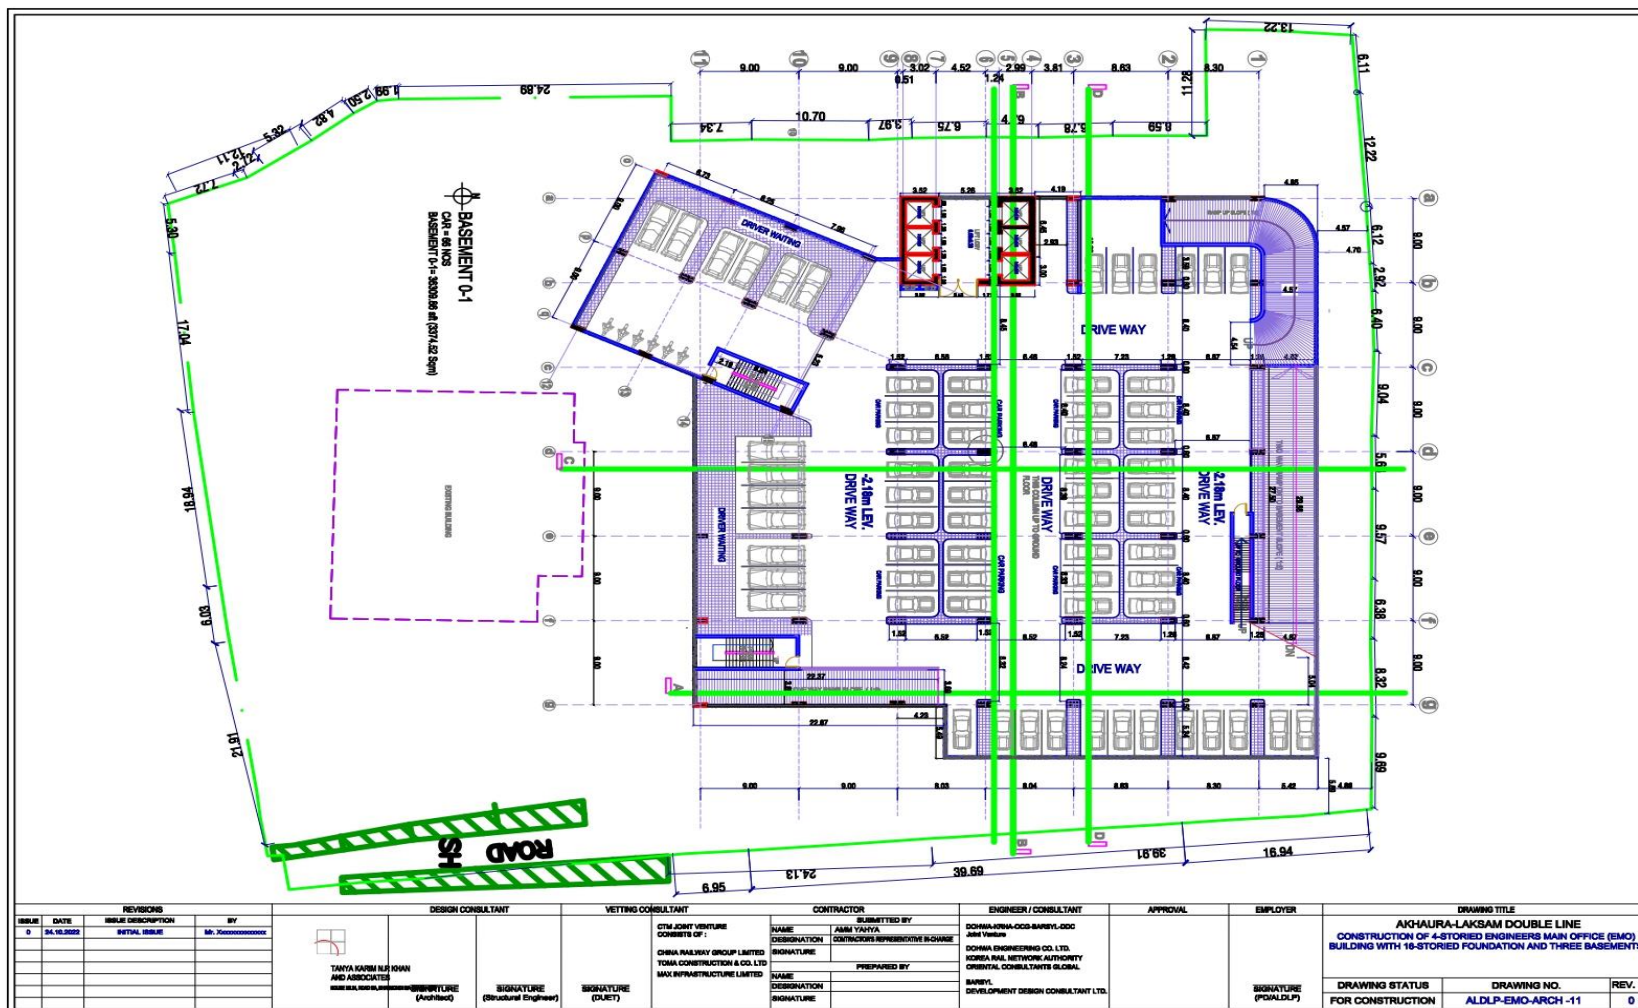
Layout Plan of Proposed EMO Building (Basement-1)
